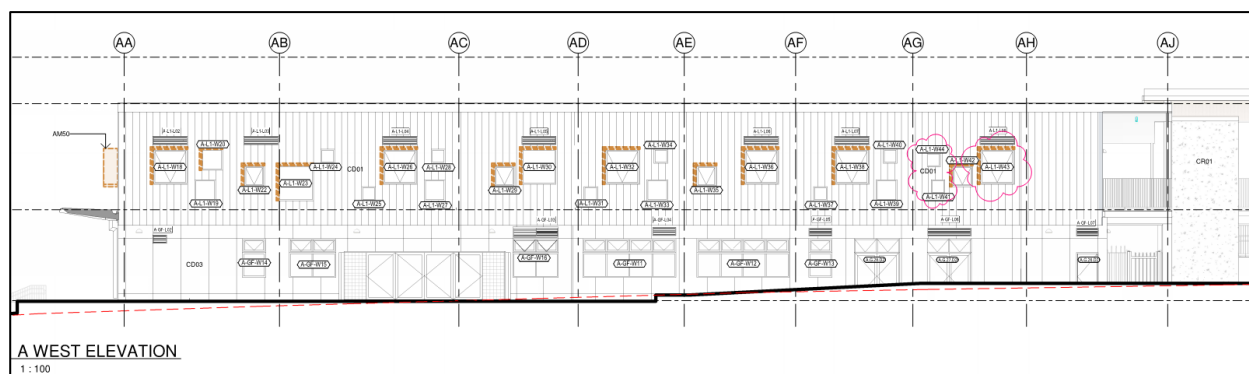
Metal wall cladding CD01 is generally used on First Floor level – as shown on Building A West Elevation. This is replicated on Building B2/B3 North Elevation. CD01 is also used in parts on the Hall Building C.
